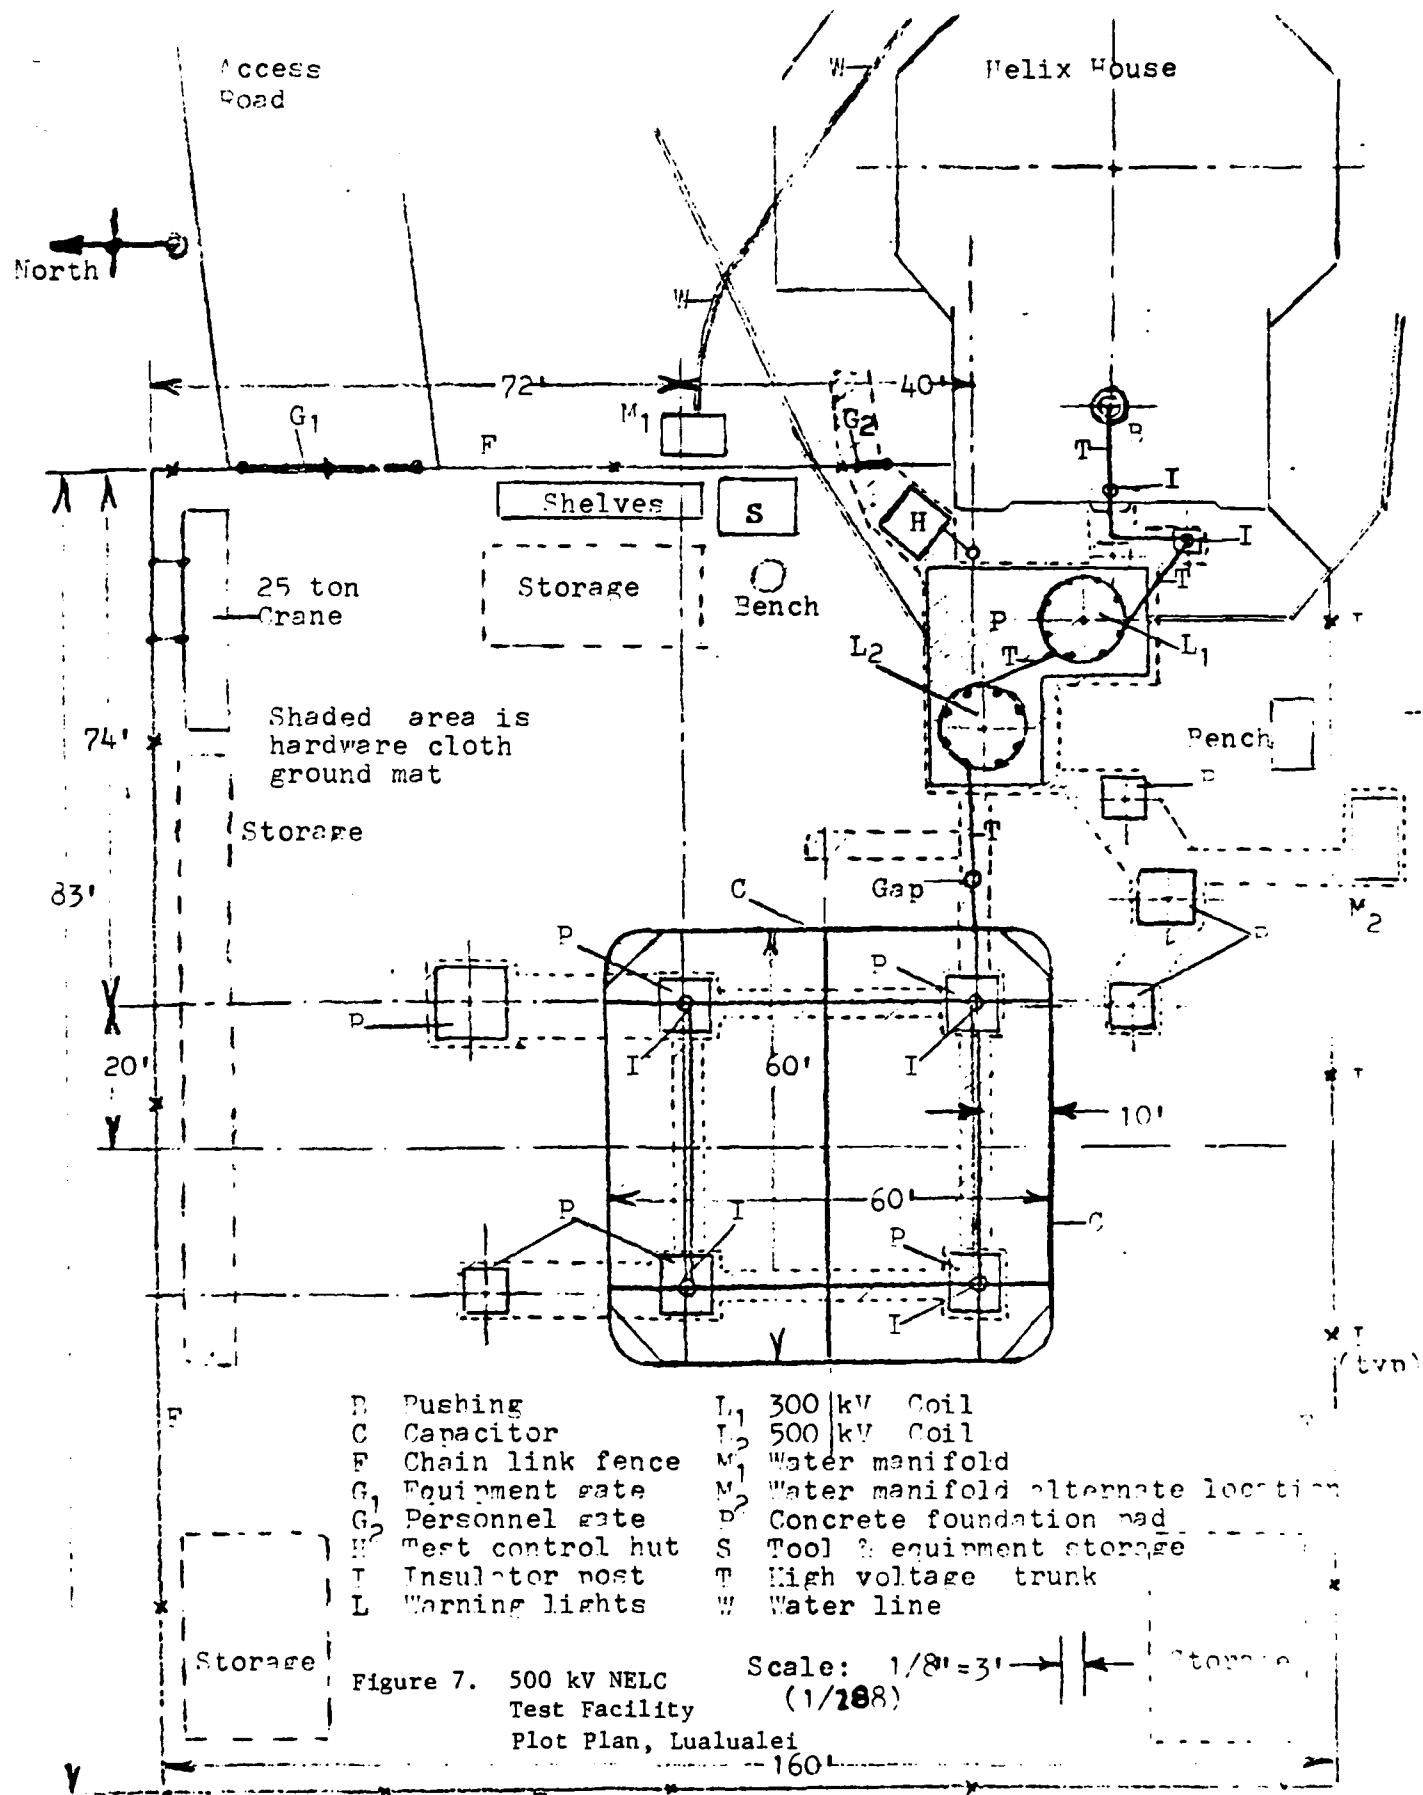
500 kV NELC Test Facility Plot Plan, Lu
